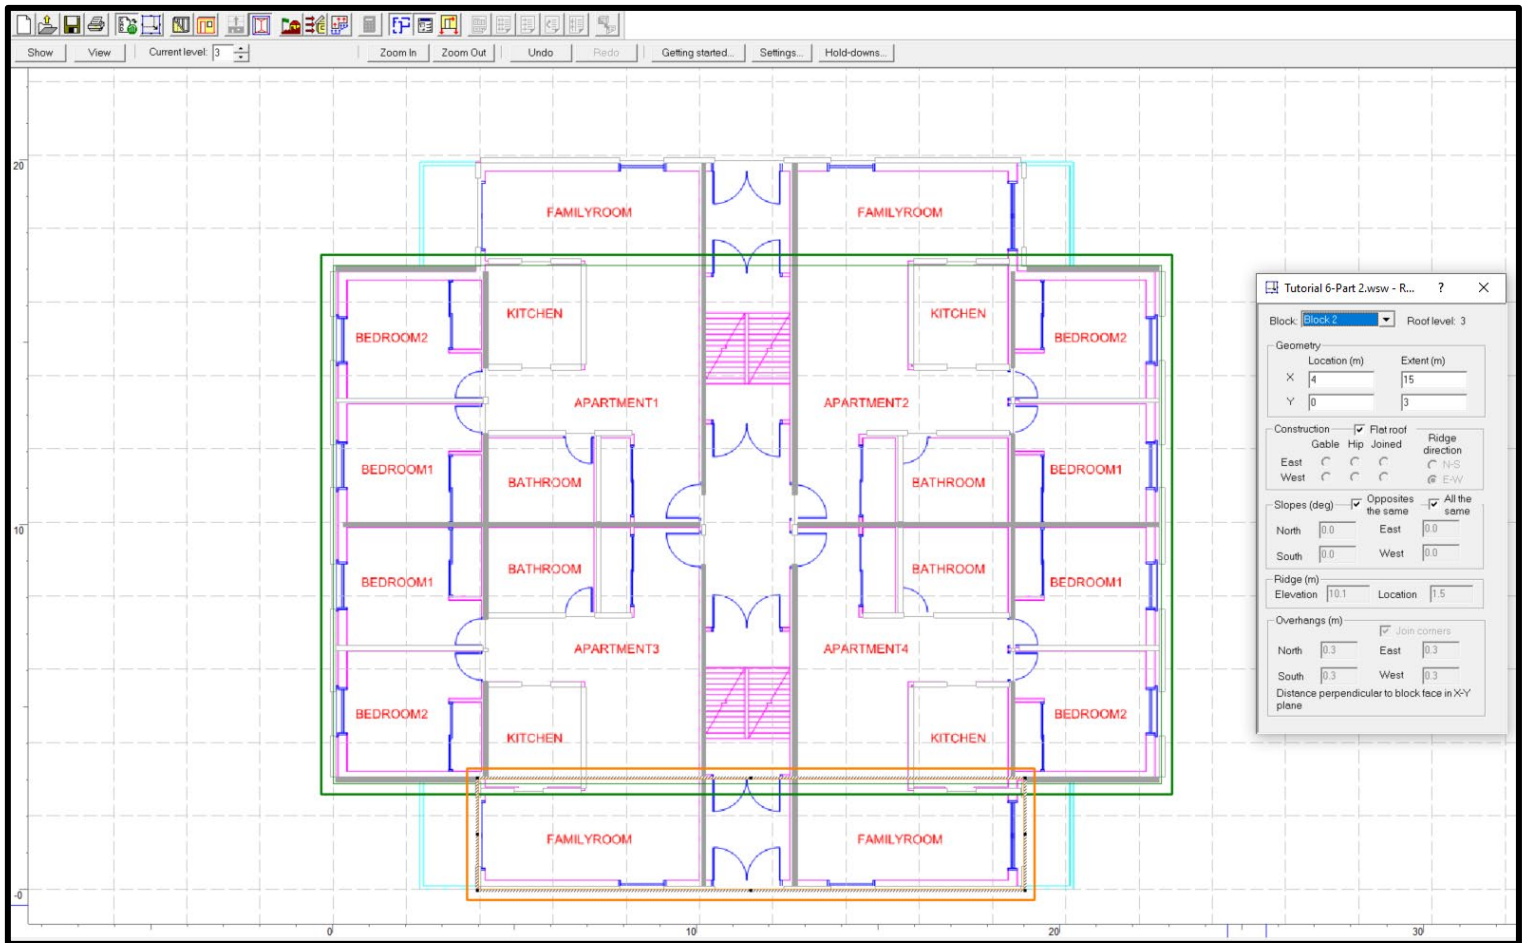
Shearwalls Tutorial 6 – Second Roof Block
